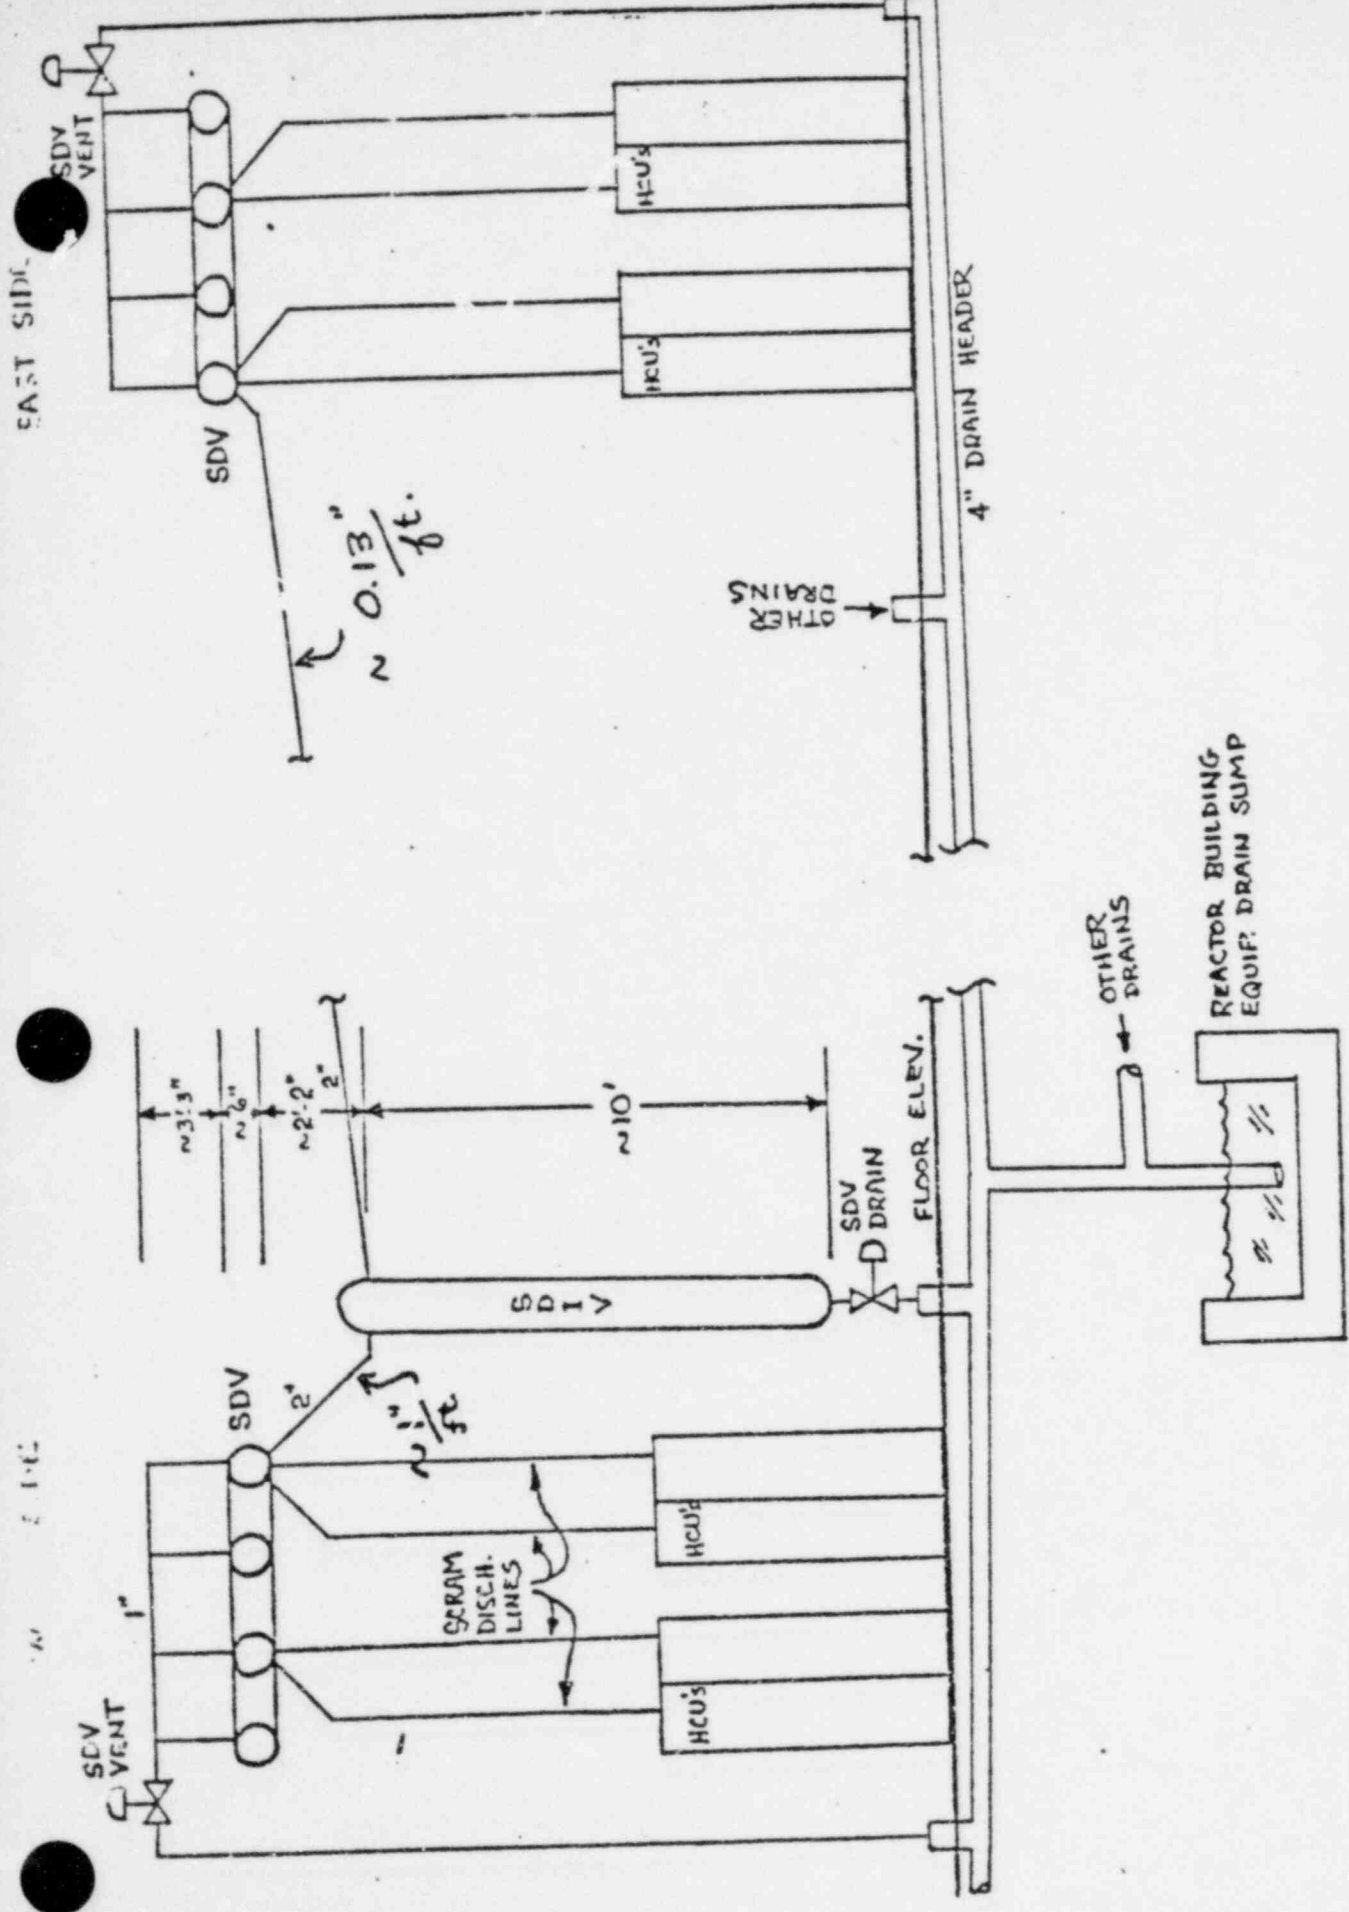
SKETCH OF BROMNS FERRY SDV EQUIPMENT LAYOUT (ELEVATION)
